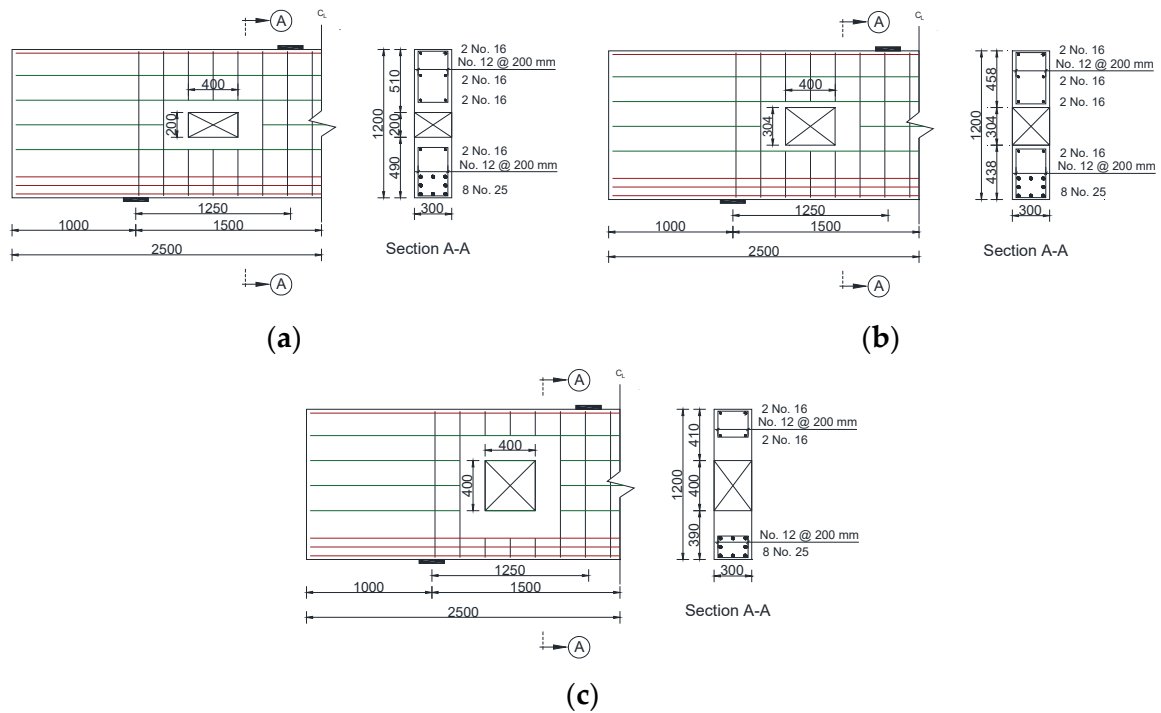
Details of deep beam models with $w_o/a = 0.32$, noting that bars with red, green, and black colors represent the main flexural reinforcement, the horizontal web reinforcement, and the vertical web reinforcement, respectively (dimensions are in mm): (a) $h_o/h = 0.17$; (b) $h_o/h = 0.25$; (c) $h_o/h = 0.33$.
